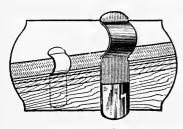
Metal clips held in place by the baseboard are sometimes used for extending cords
